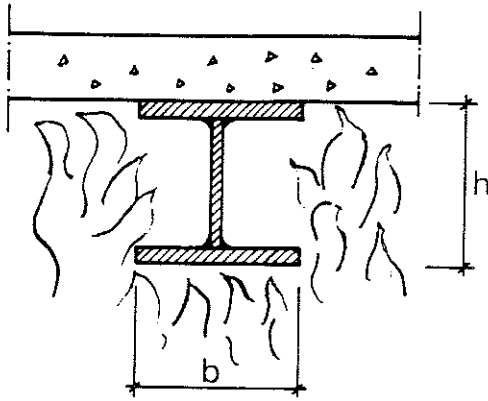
c. Floor construction where the flames penetrate between the girders
